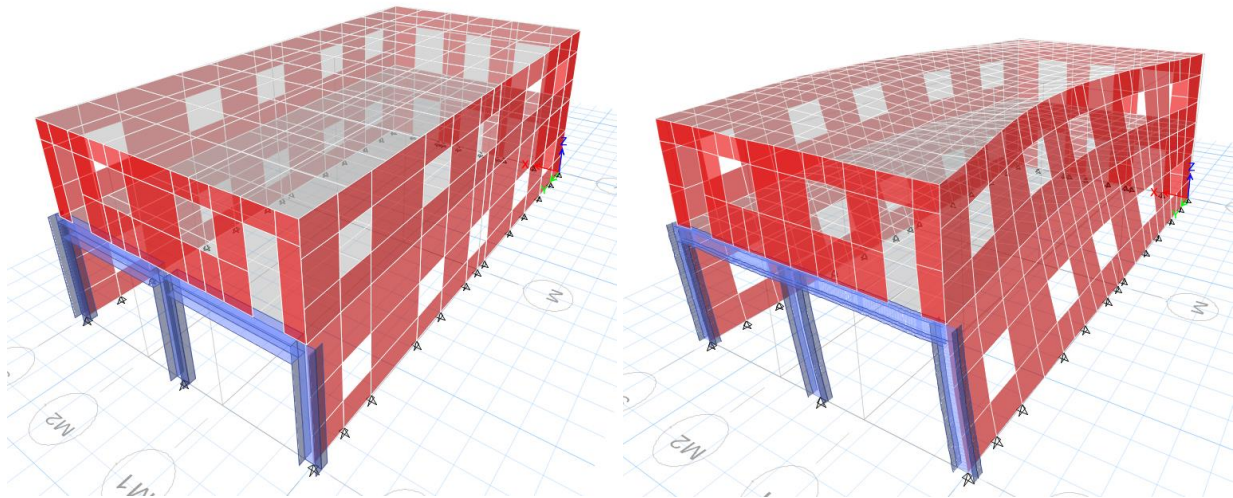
Retrofit Situation 3b ETABS model with undeformed shape (left) and deformed shape (right).
